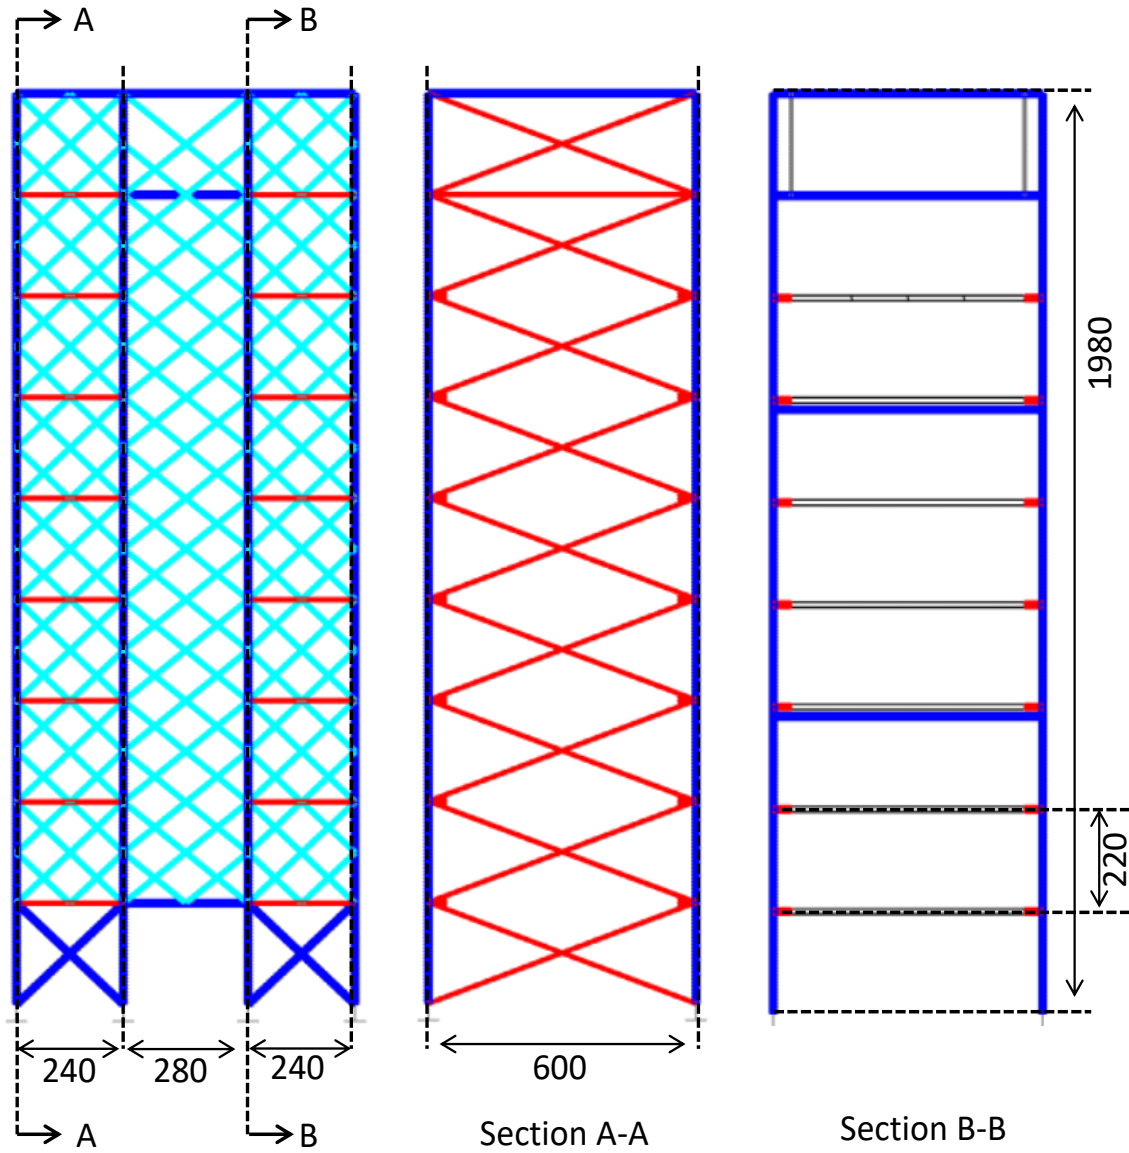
Structural design of the 8-floor AVPS unit (lengths in cm)
